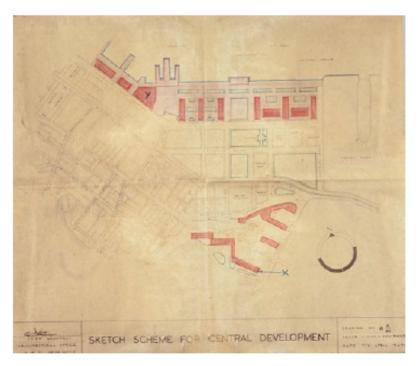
Plan showing the proposed layout of the new CGO, April 1949 (HK PRO, HKRS 156-1-1803)
